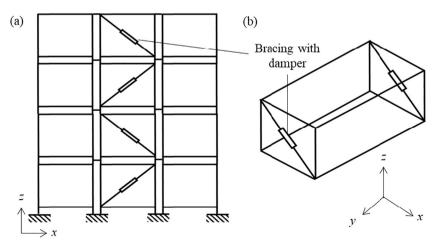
Adding steel bracing with damper: (a) elevation view of a modular braced frame and (b) 3D view of a module.
